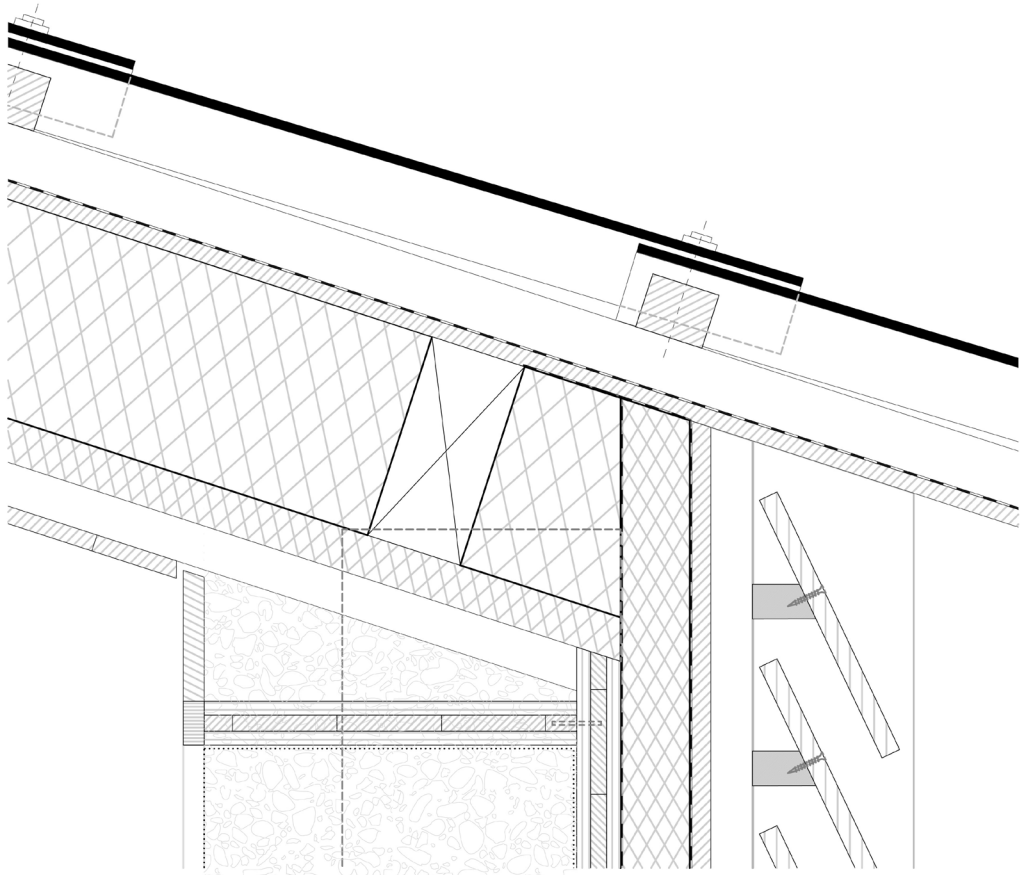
Detail 1:5 Story and Connection Roof to Wall , Wood
